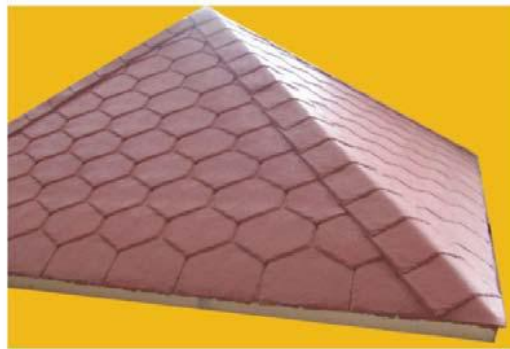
Install the first piece at the bottom of the hip. Cut the top shingle to line up with the other shingles. Mold shingle to the shape of the hip.
